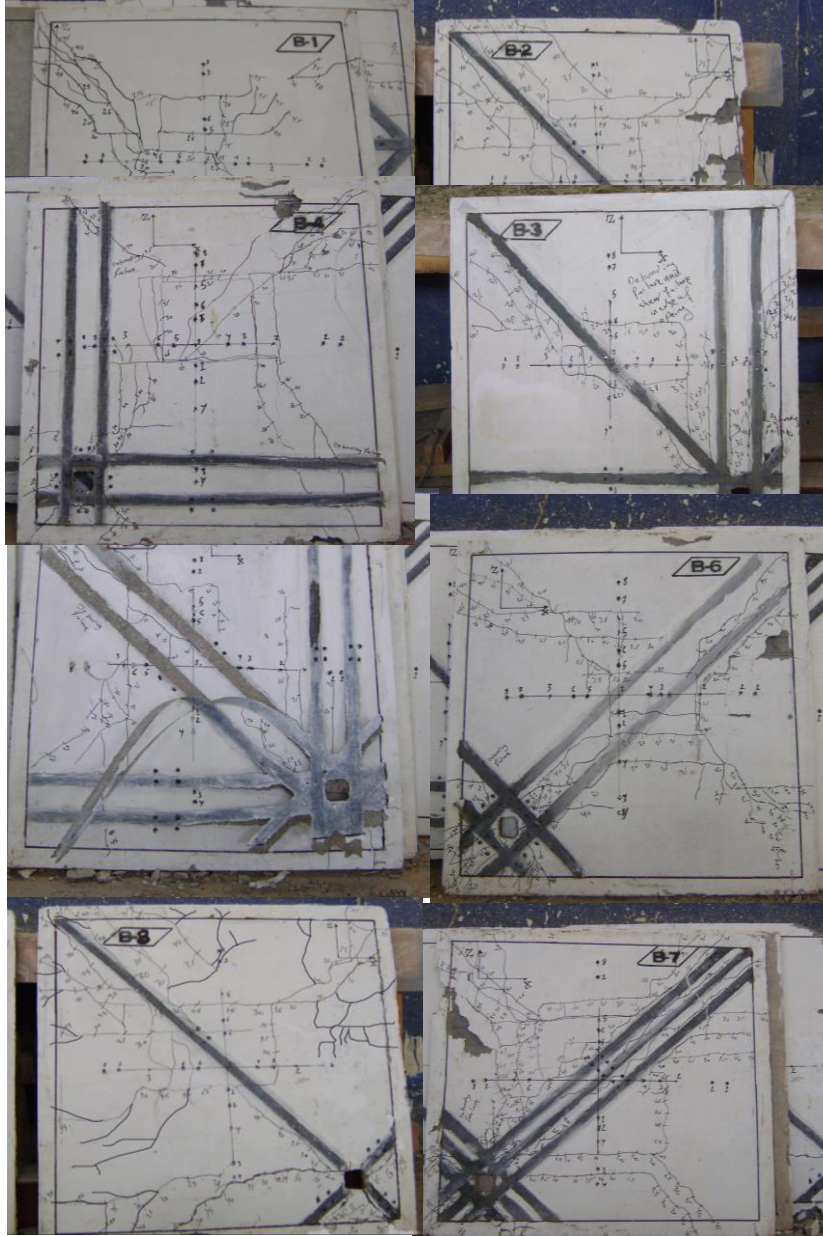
Crack pattern after failure for series (B) slab specimen.
